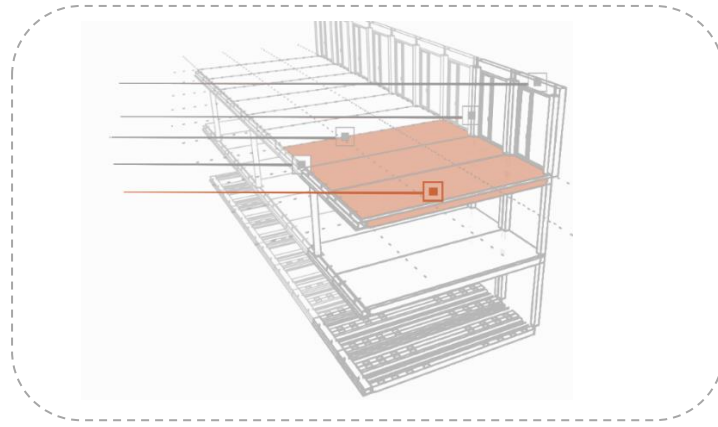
The slab panels combine concrete and wood. (Sustainable building systems | timber hybrid office buildings - CREE Buildings)
